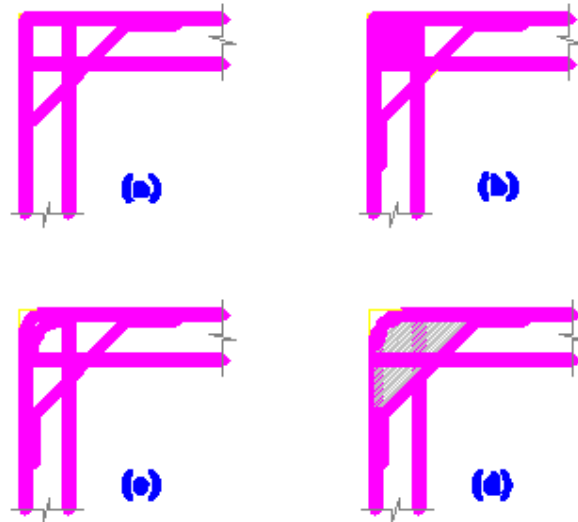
Detailing of knee joints: (a) 90 degree opening corners of members with percentage of steel < 1 : splay to be 50% of main steel; (b) joints under alternating loads; (c) alternative to (a); and (d) members with more than 1% steel (SP 34 pages 110).
